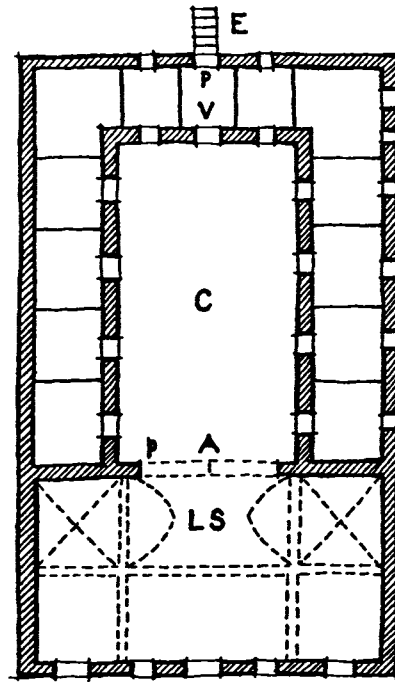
Sketch plan of the Jāwiliyya (after van Berchem)
